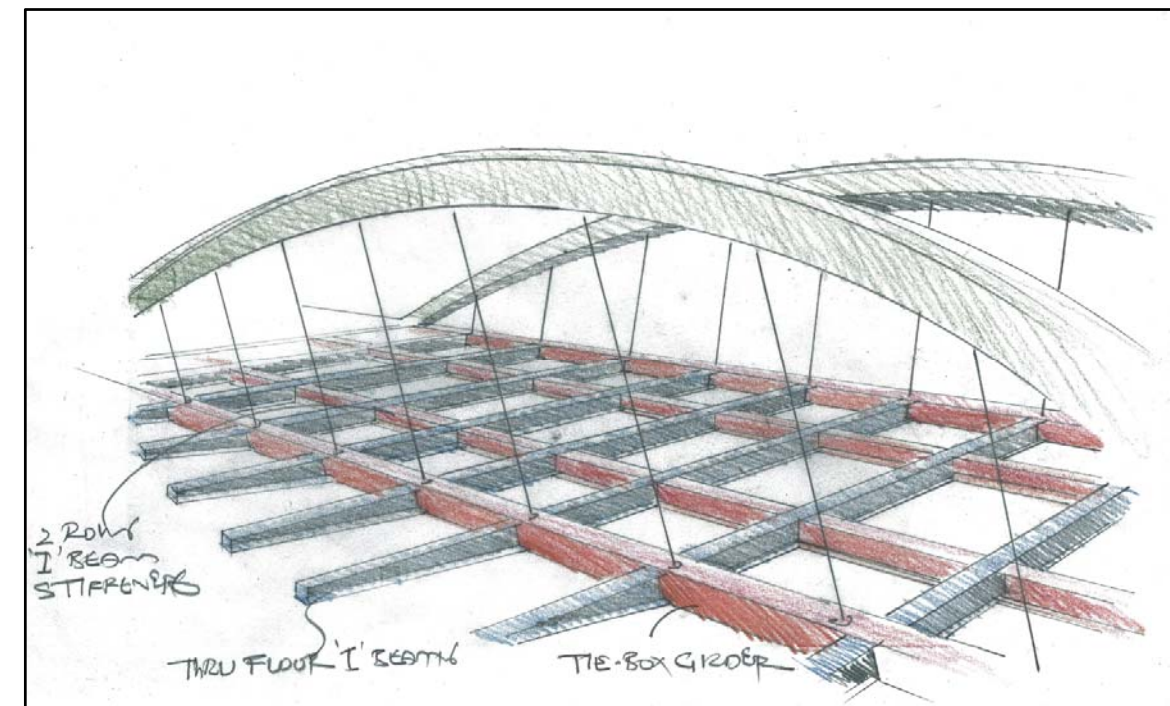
Artist Rendering of Tied Arch Main Components
